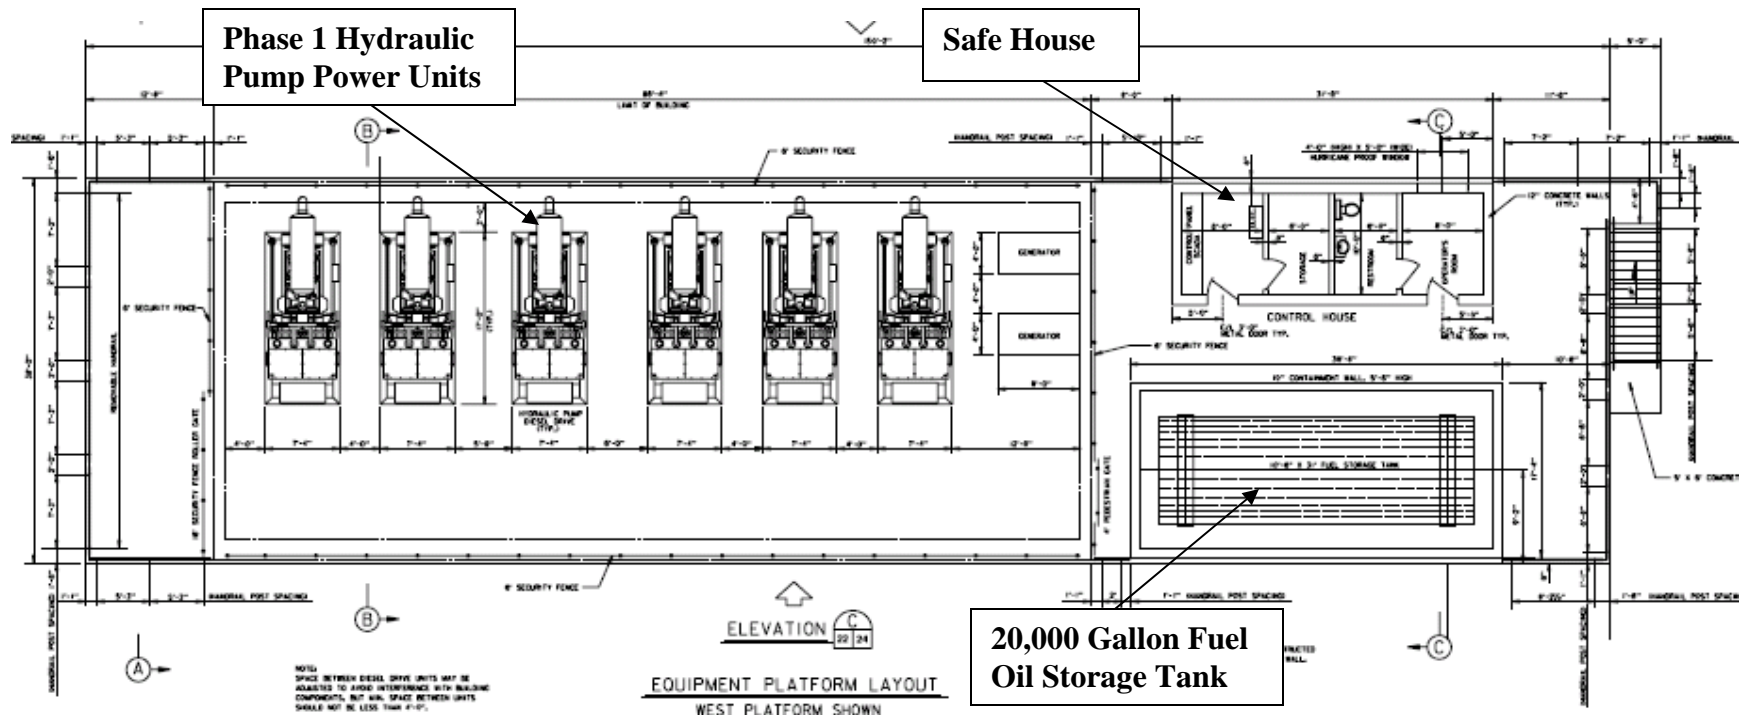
London Avenue Phase 1 Engine Platform Typical Plan
